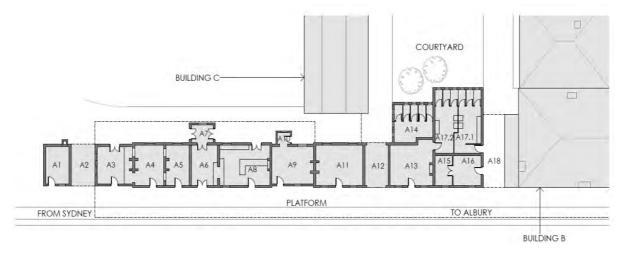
Existing plan of Building A with room numbers. (Source: CMP 2020)
